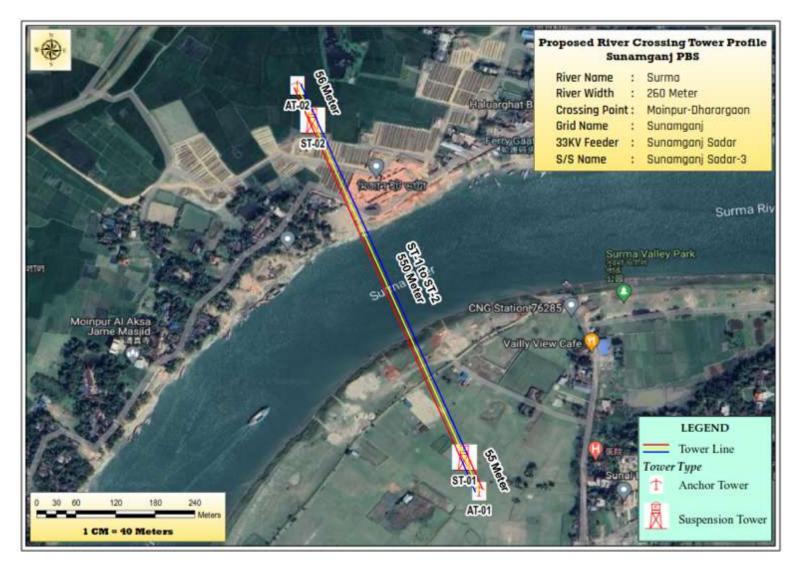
Proposed Surma River Crossing Tower of Sunamganj PBS
